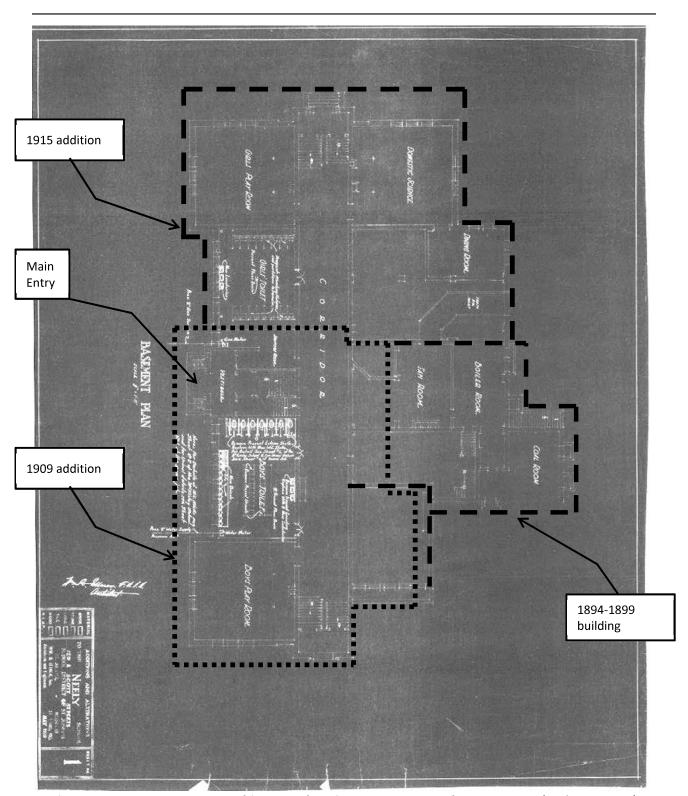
WM. B. Ittner, Inc. Architects and Engineers, Basement Plan, May 1929 (Architect 1929)
